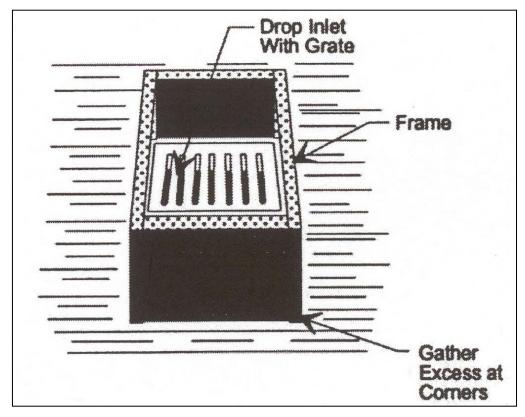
Fabric Drop Inlet Protection Typical Section
